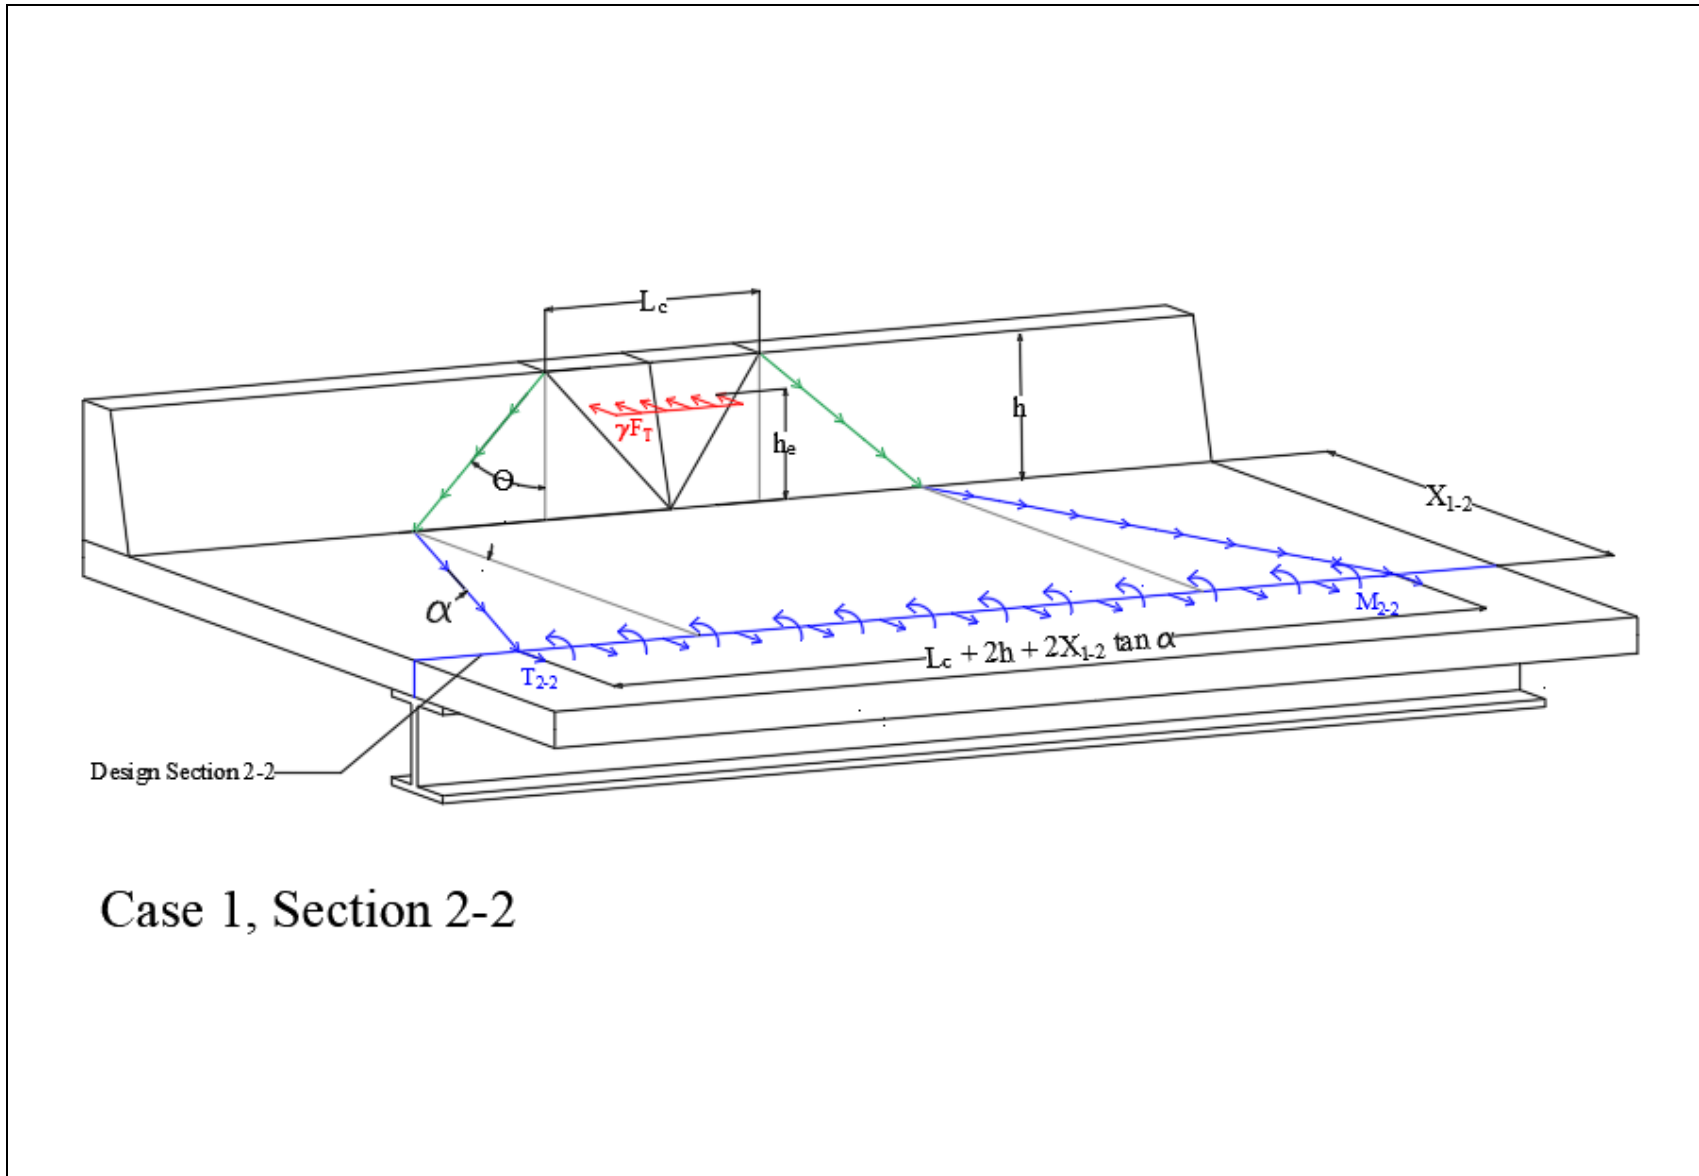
Generic Bridge Rail for Load Case 1, Section 2-2
